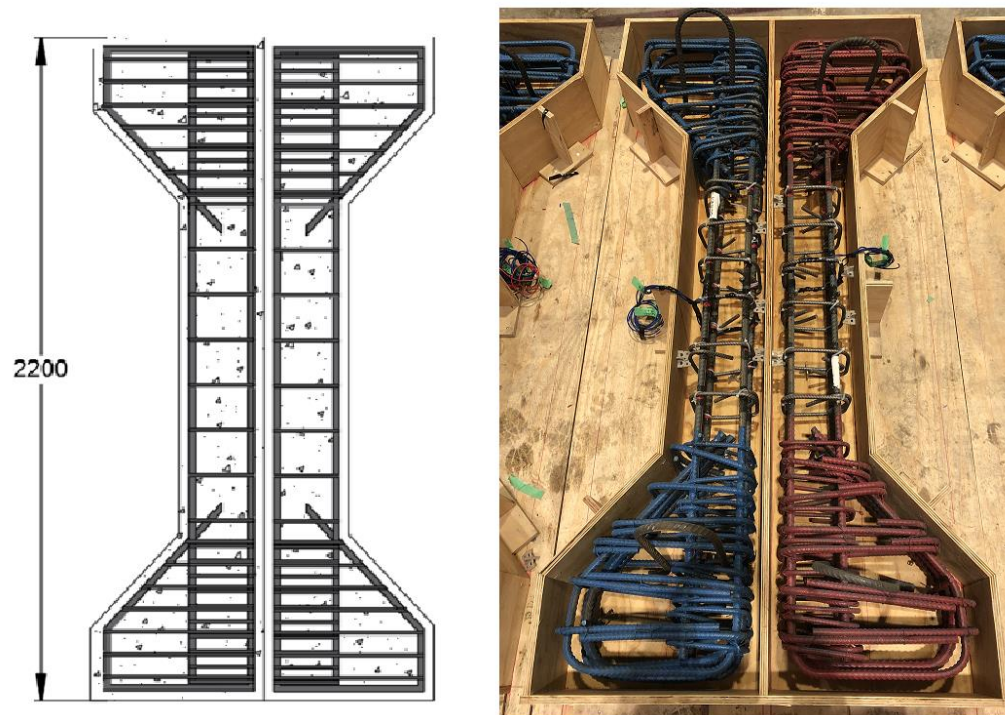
Casting and formwork of concrete columns (dimensions in mm) with epoxy-coated corbel sections
